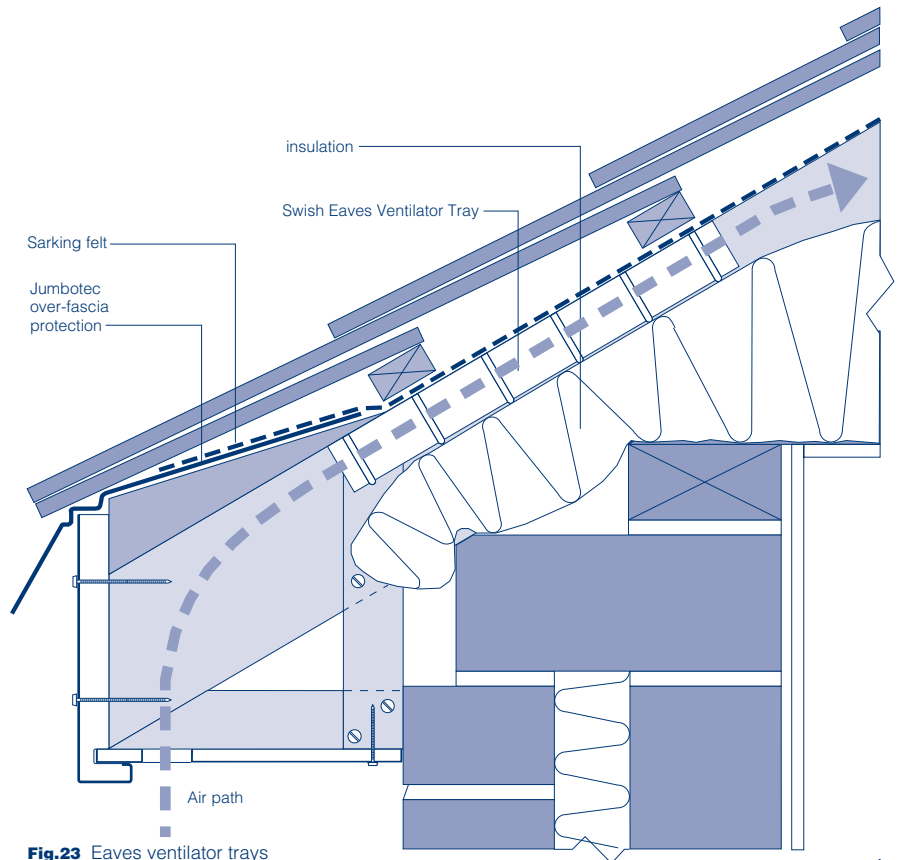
Eaves ventilator trays fixed to rafters over insulation to provide equivalent 10 mm continuous air path into roof void
